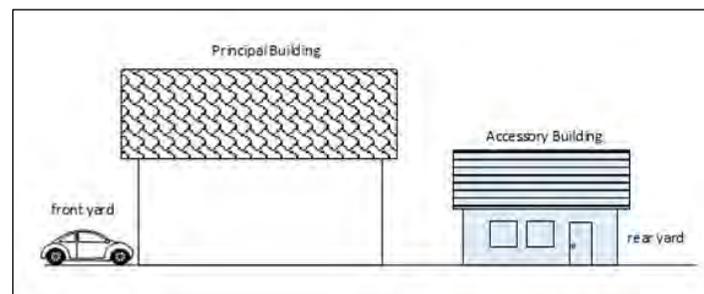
ACCESSORY DWELLING UNIT WITHIN AN ACCESSORY BUILDING.
